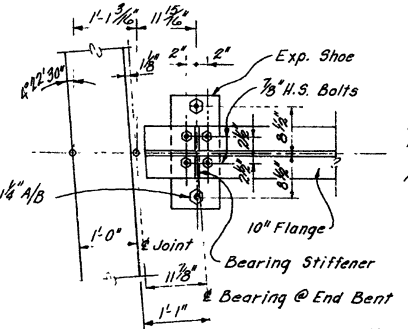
DETAILS OF TOP FLANGE AT GIRDER ENDS
